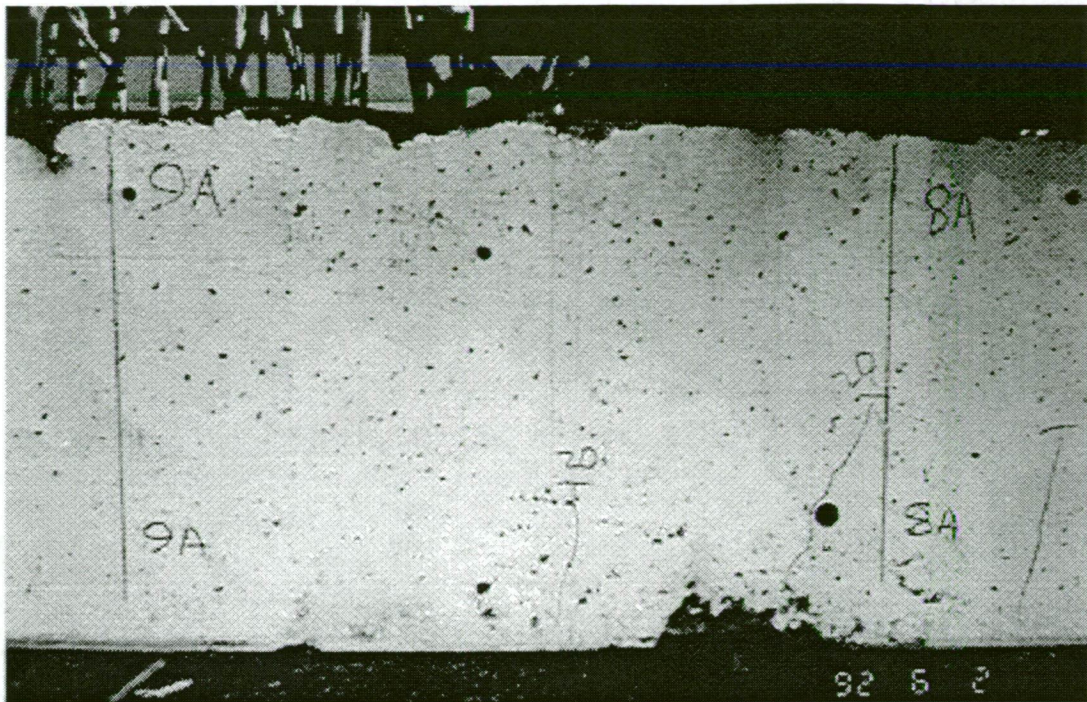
Flexural Beam Crack Patterns
